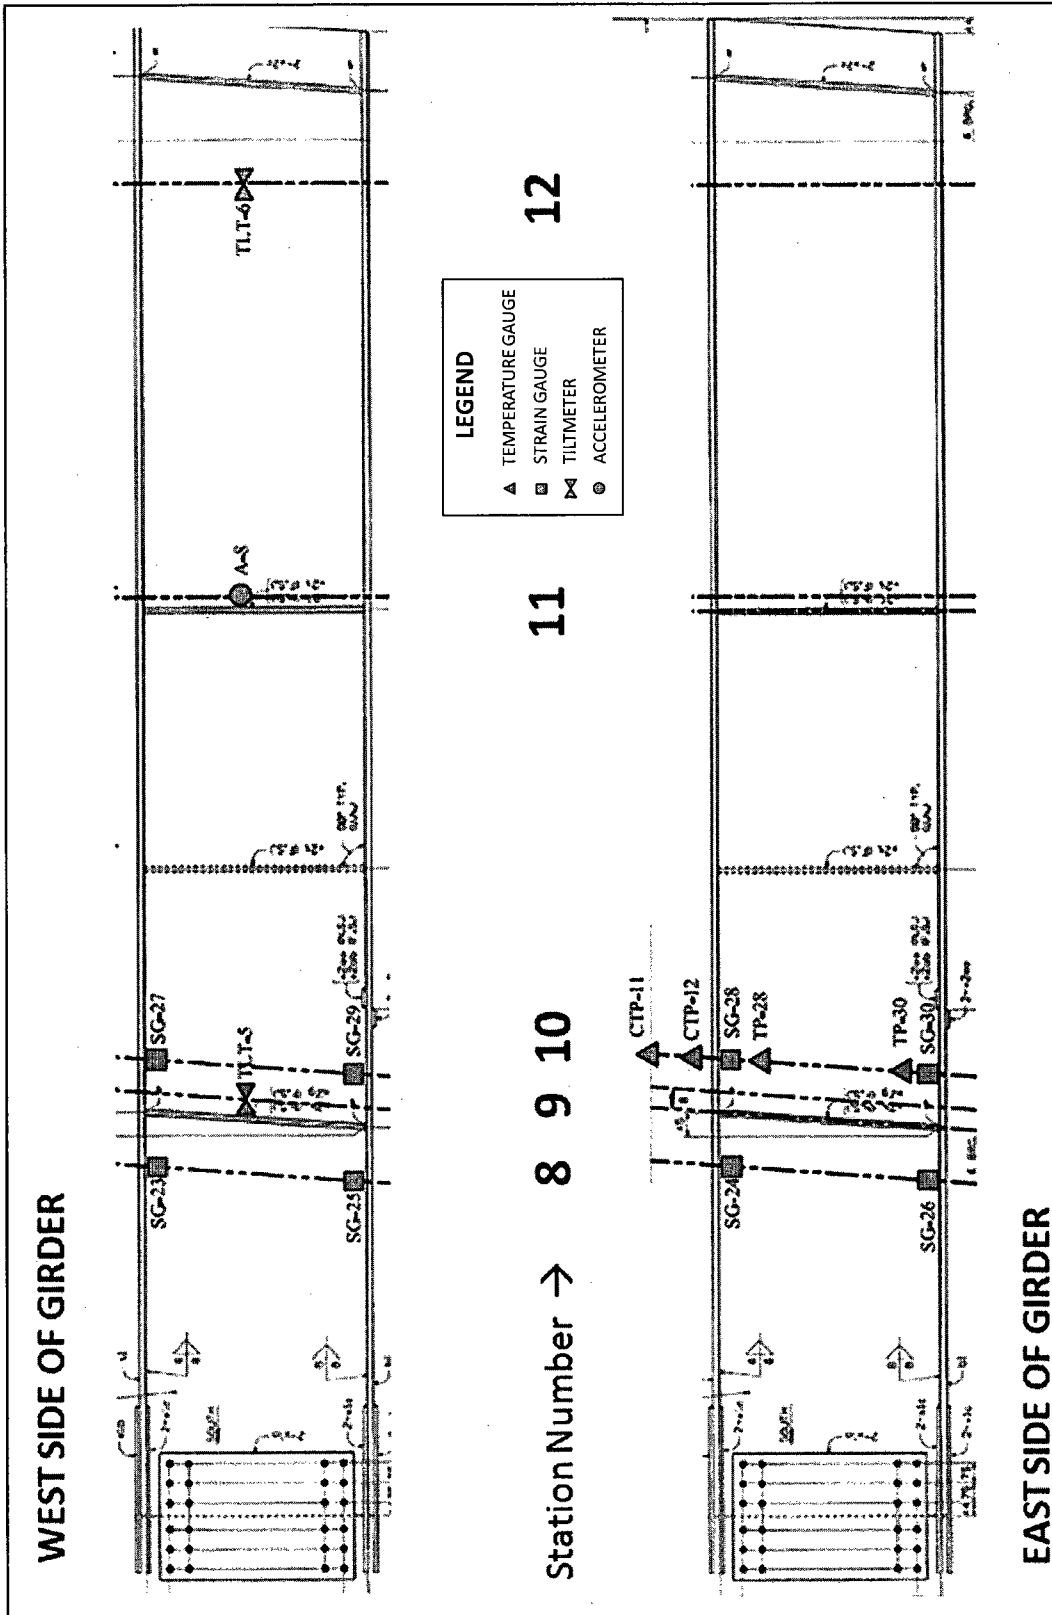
Sample girder elevation showing instrumentation of the north section of girder 2
